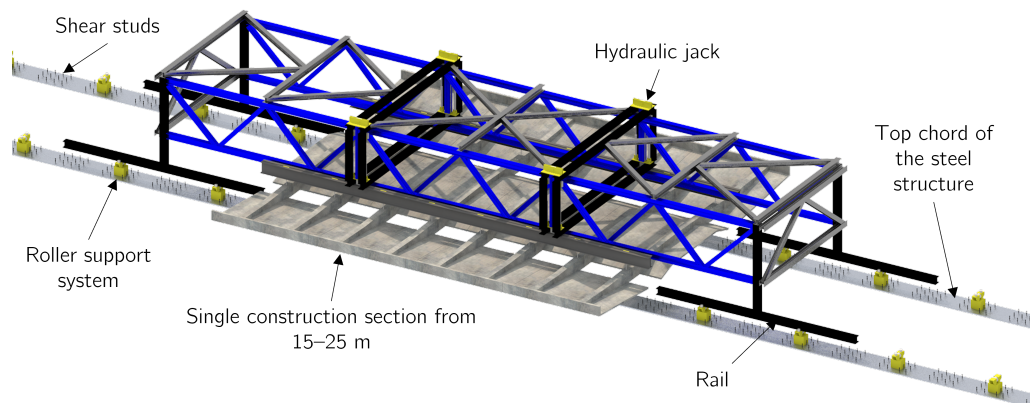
Transportation carriage for the placement of a defined section of precast deck slab elements on an already installed steel structure.
